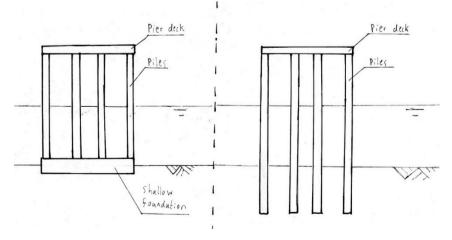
Schematisation of piles on a shallow foundation (left) and a pile foundation (right).
